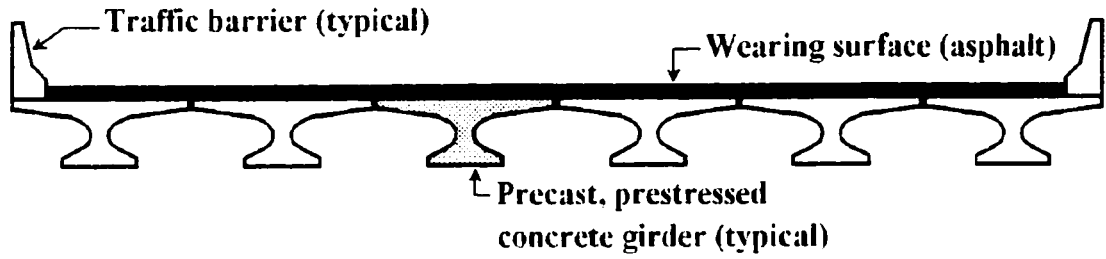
Typical Nebraska All-precaster Bridge of Bulb Tee Sections
